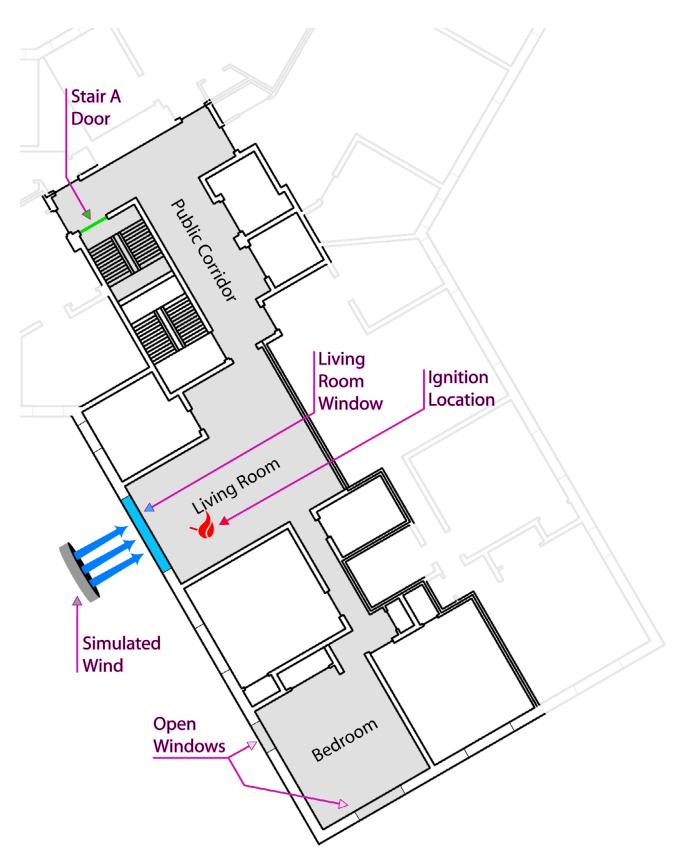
5<sup>th</sup> floor apartment E floor plan with locations pertinent to Experiment 5E2
